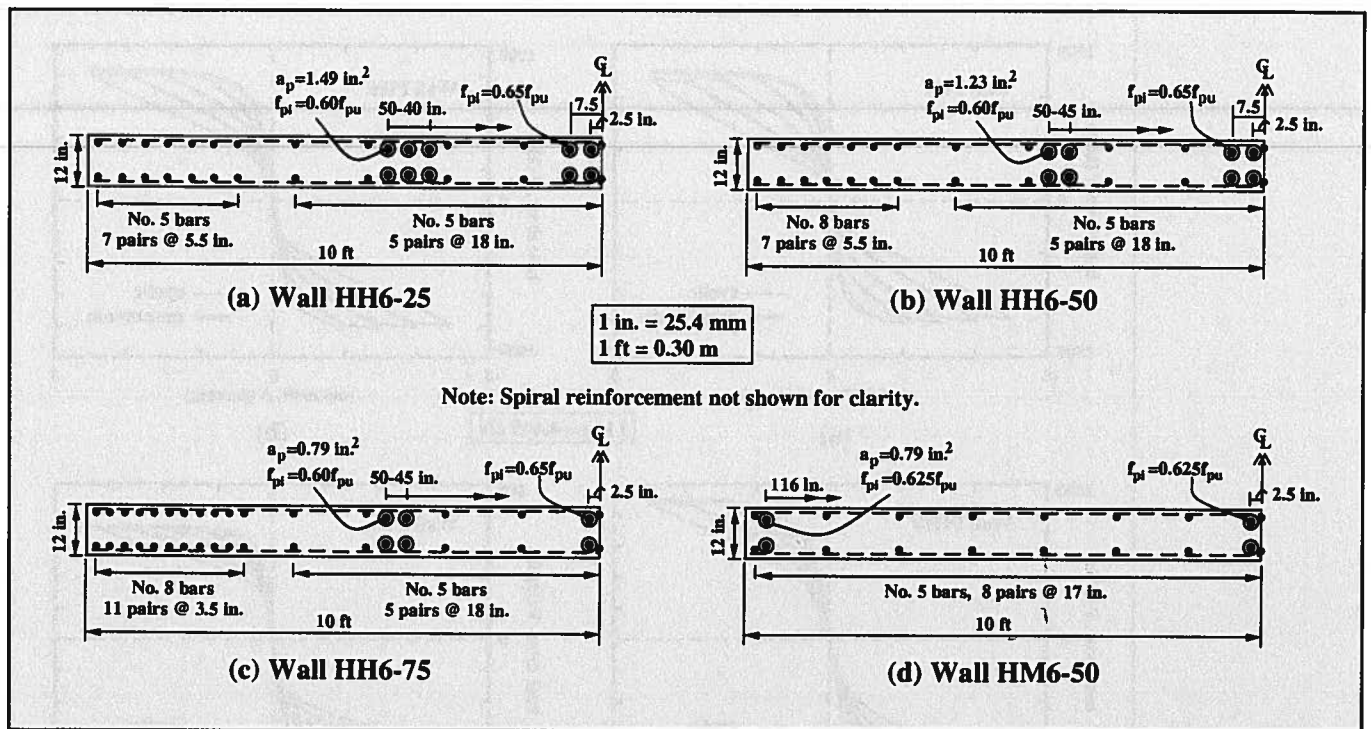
Cross section (half wall length near base) of hybrid walls: (a) HH6-25; (b) HH6-50; (c) HH6-75; (d) HM6-50.
